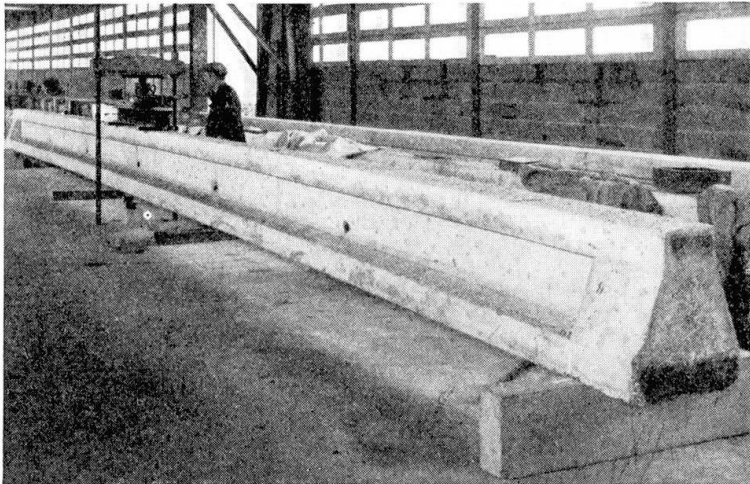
Checking test bridge beam 50 ft. at Shorne 1952
